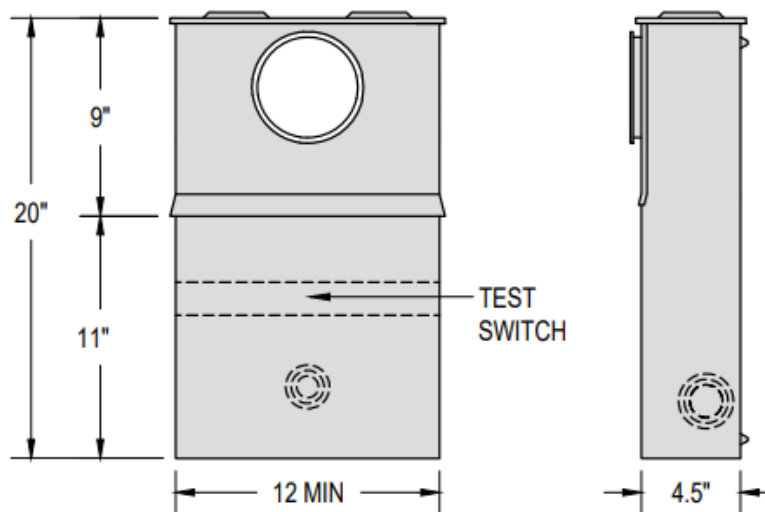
Current Transformer Meter Socket Enclosure (STD-D-6238)
